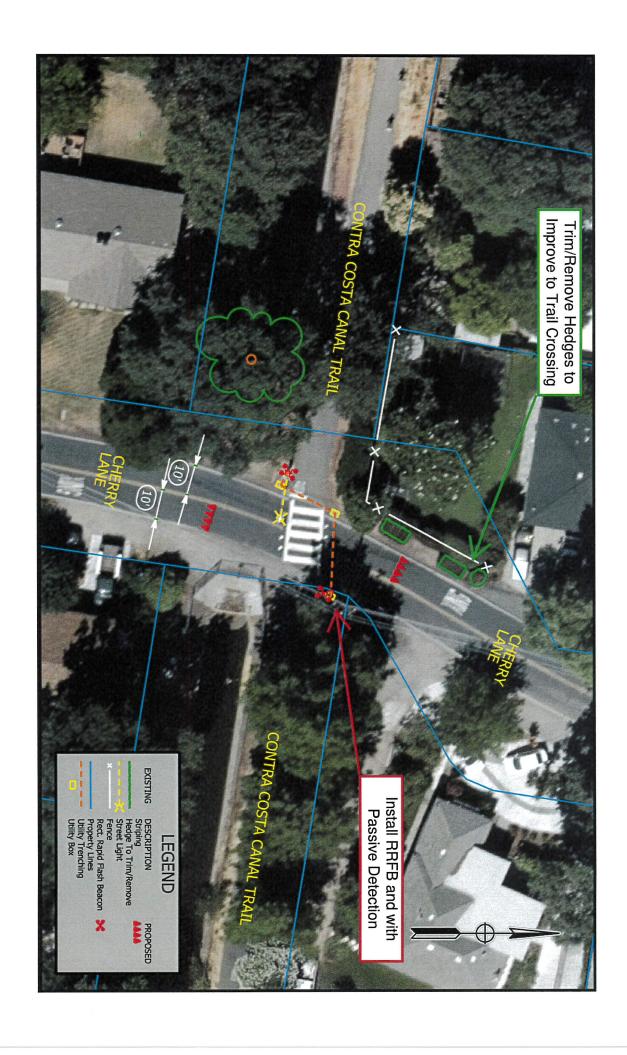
Proposed Layout, South Site (Cherry Lane Crossing) Mayhew Way and Cherry Lane Trail Crossing Enhancements Project
